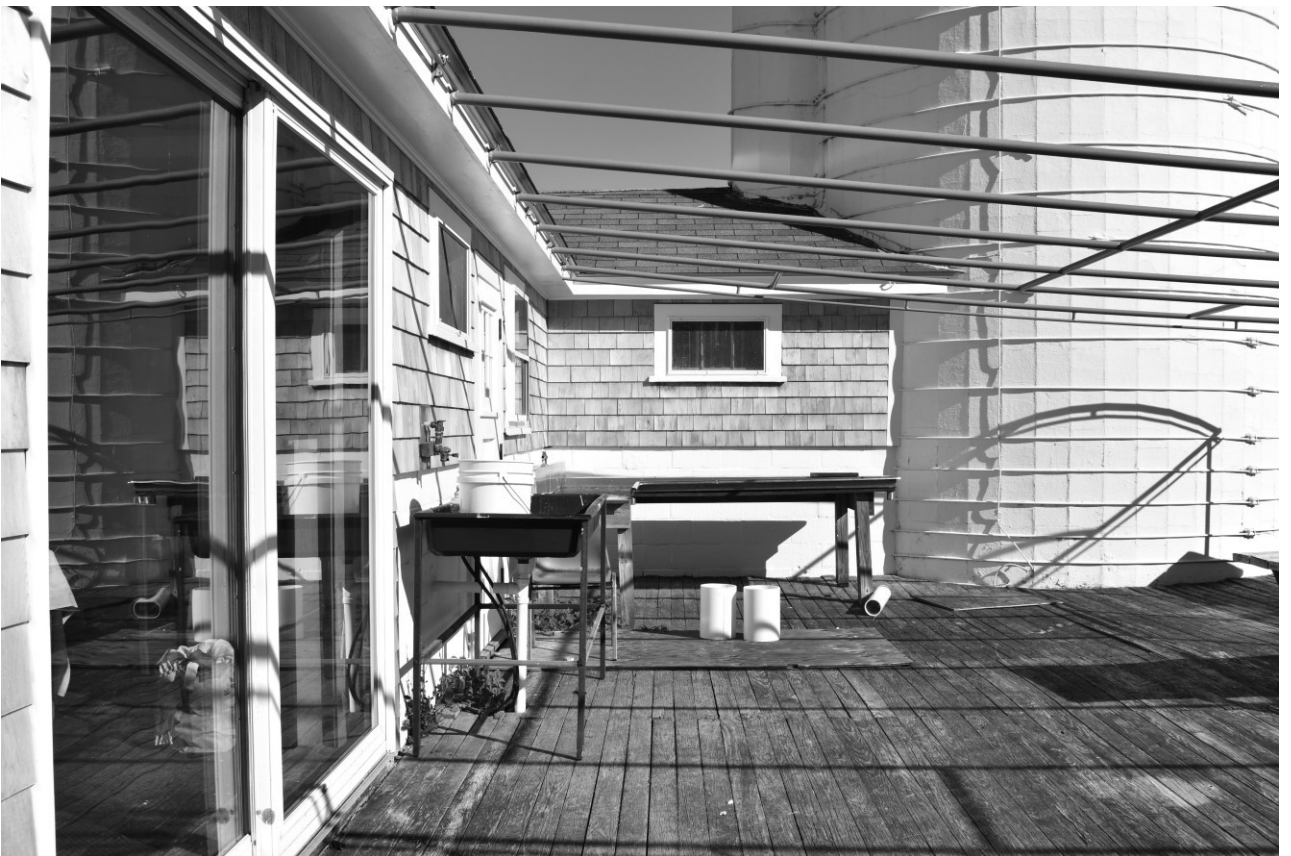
east elevation of Barn, south elevations of connector to West Silo & Silo
